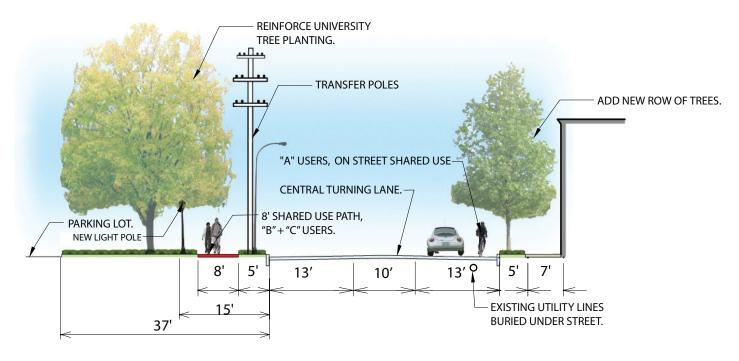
The Hub: Zone 8 Floyd Street Prototypical Cross-Section
